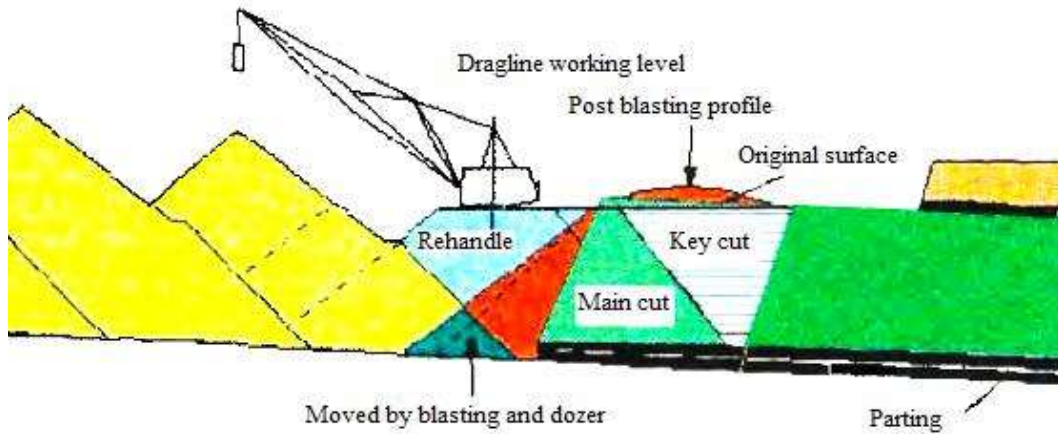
Cross-sectional view of a standard extended bench method combined with a cast blasting technique (Mirabediny,1998).
